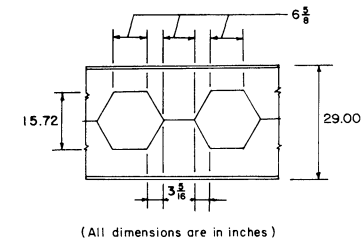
Specimen 3: Original beam W21×96, expanded to 29.0×96-3
